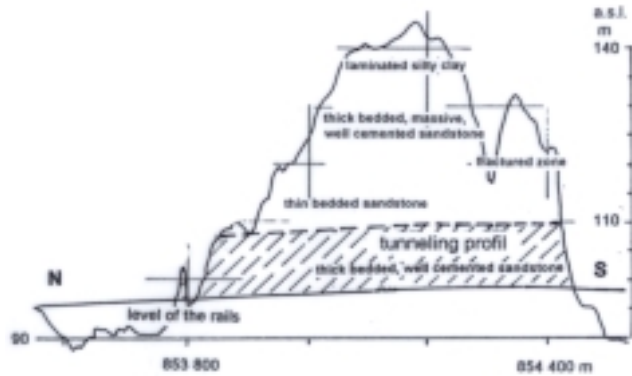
Simplified cross-section of the tunnel version, El Gaafera section
